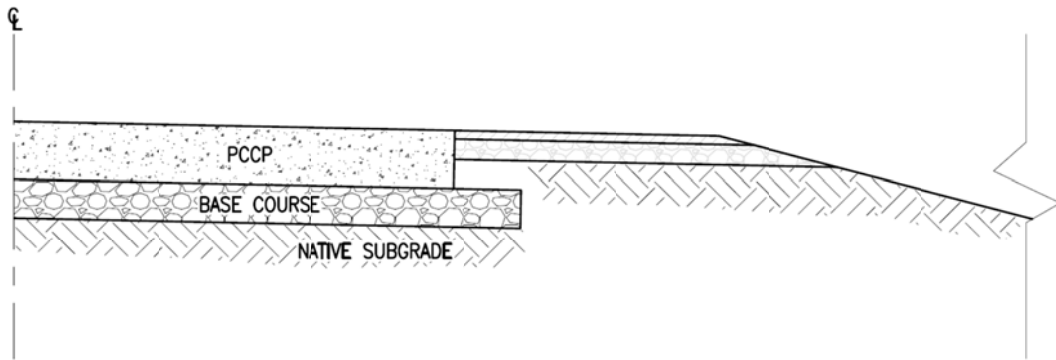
Cross section showing existing PCC pavement without daylighted shoulders.
